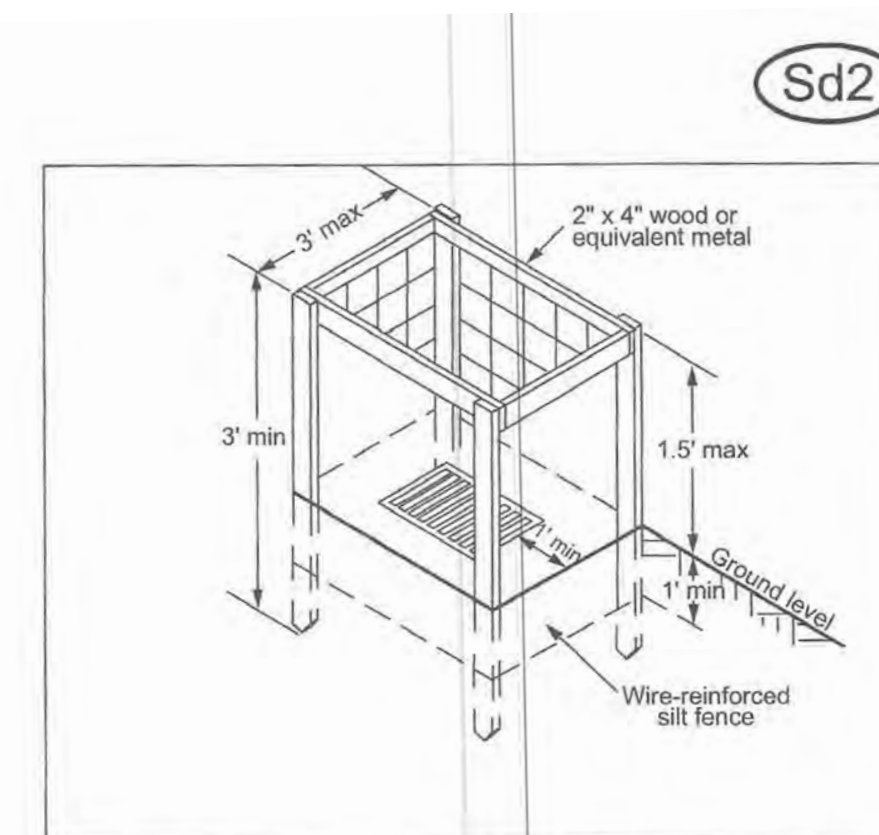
Fabric and supporting Frame for Inlet Protection (Sd2-F)
